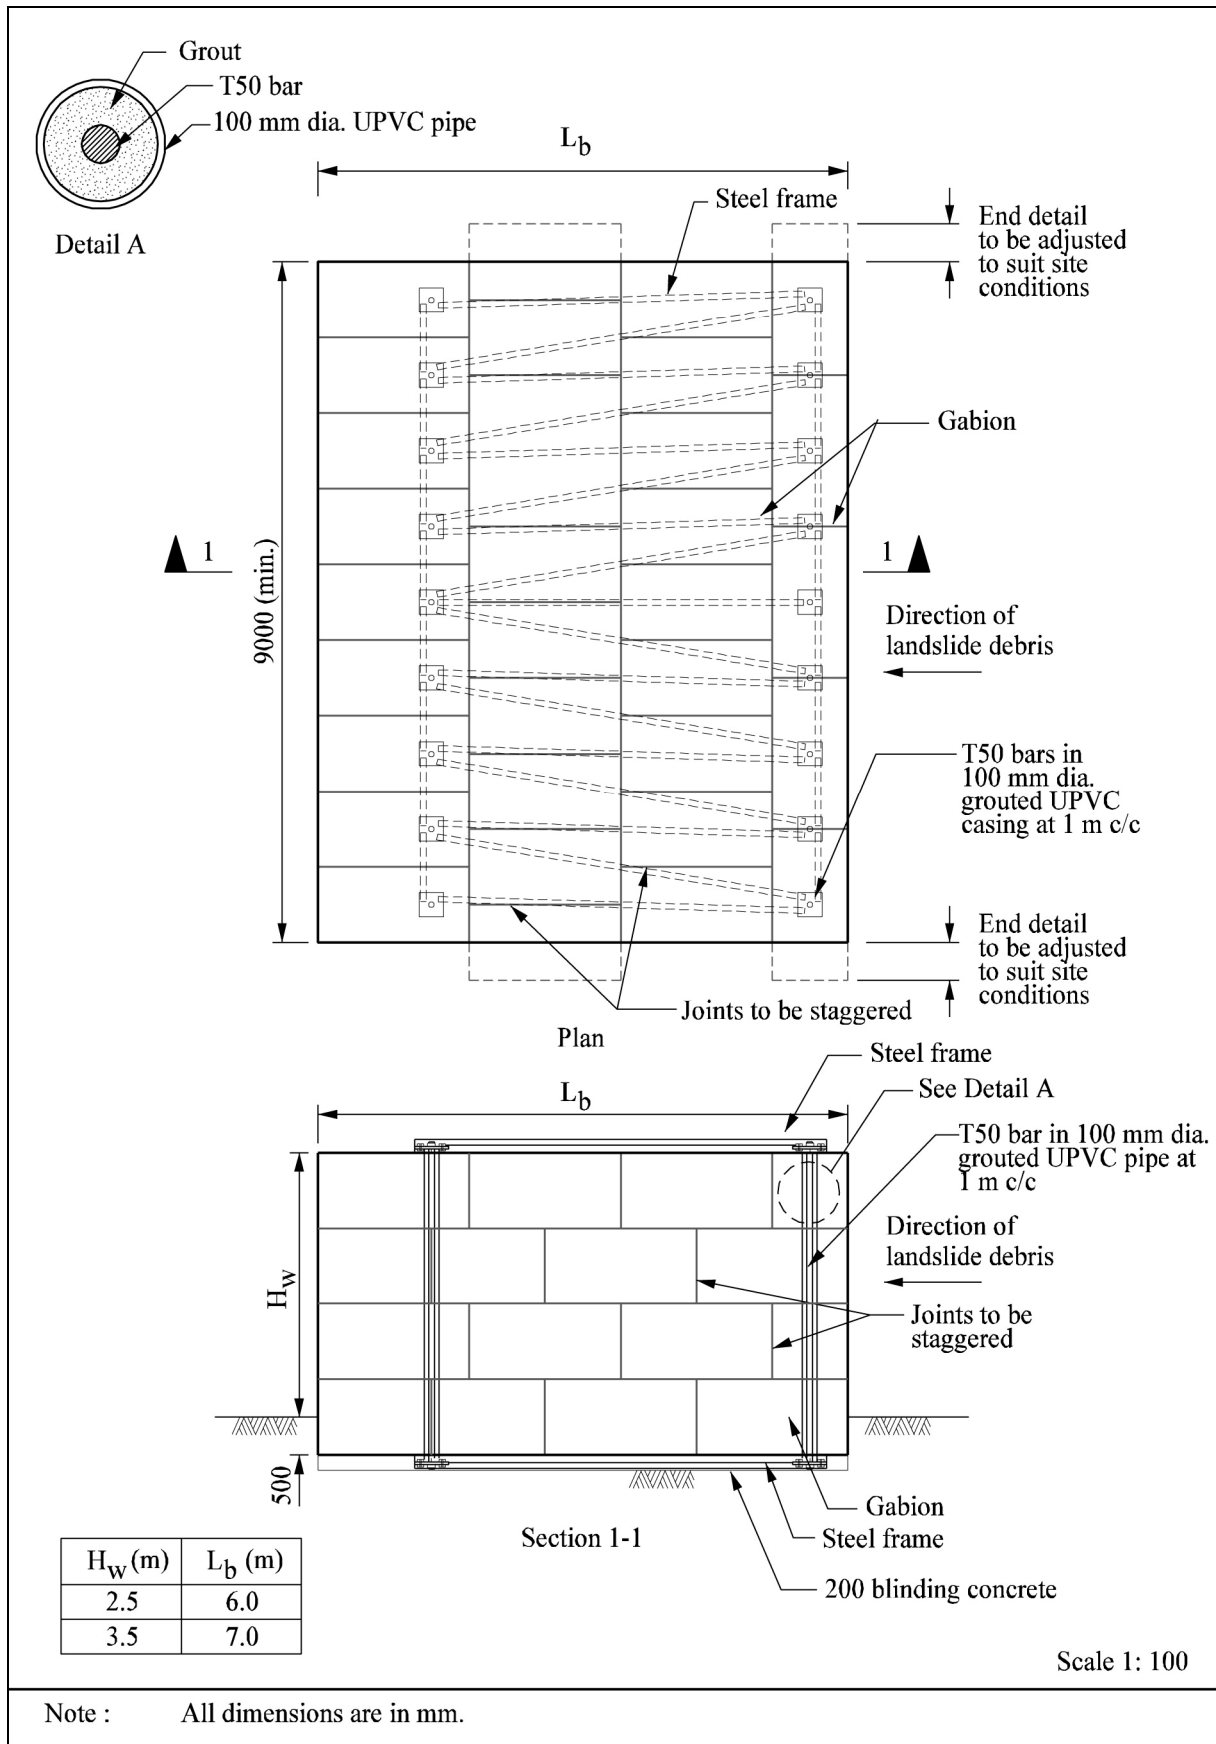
Reinforced Gabion Barrier (Type 3A Barrier)
